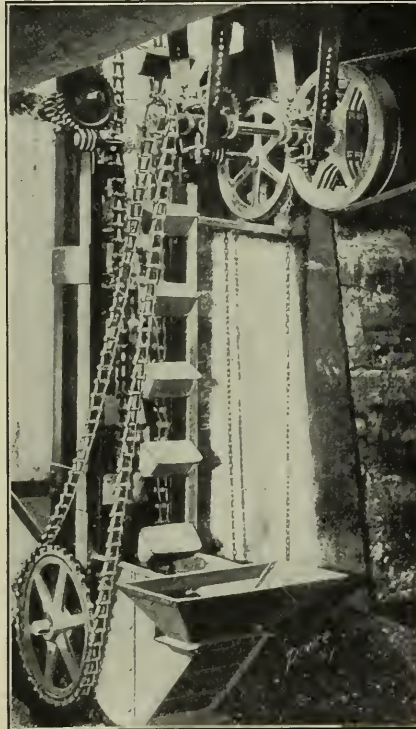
TELESCOPIC SIDEWALK ASH ELEVATOR EXTENDED
